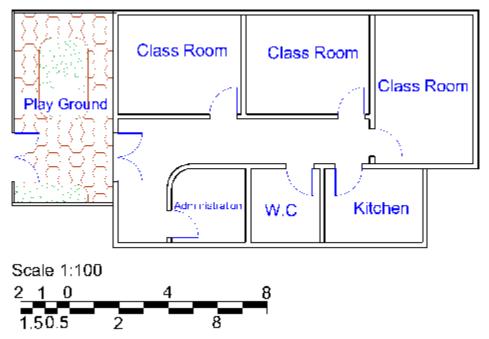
Floor plan of Tripoli B Kindergarten (Drawn by author)
